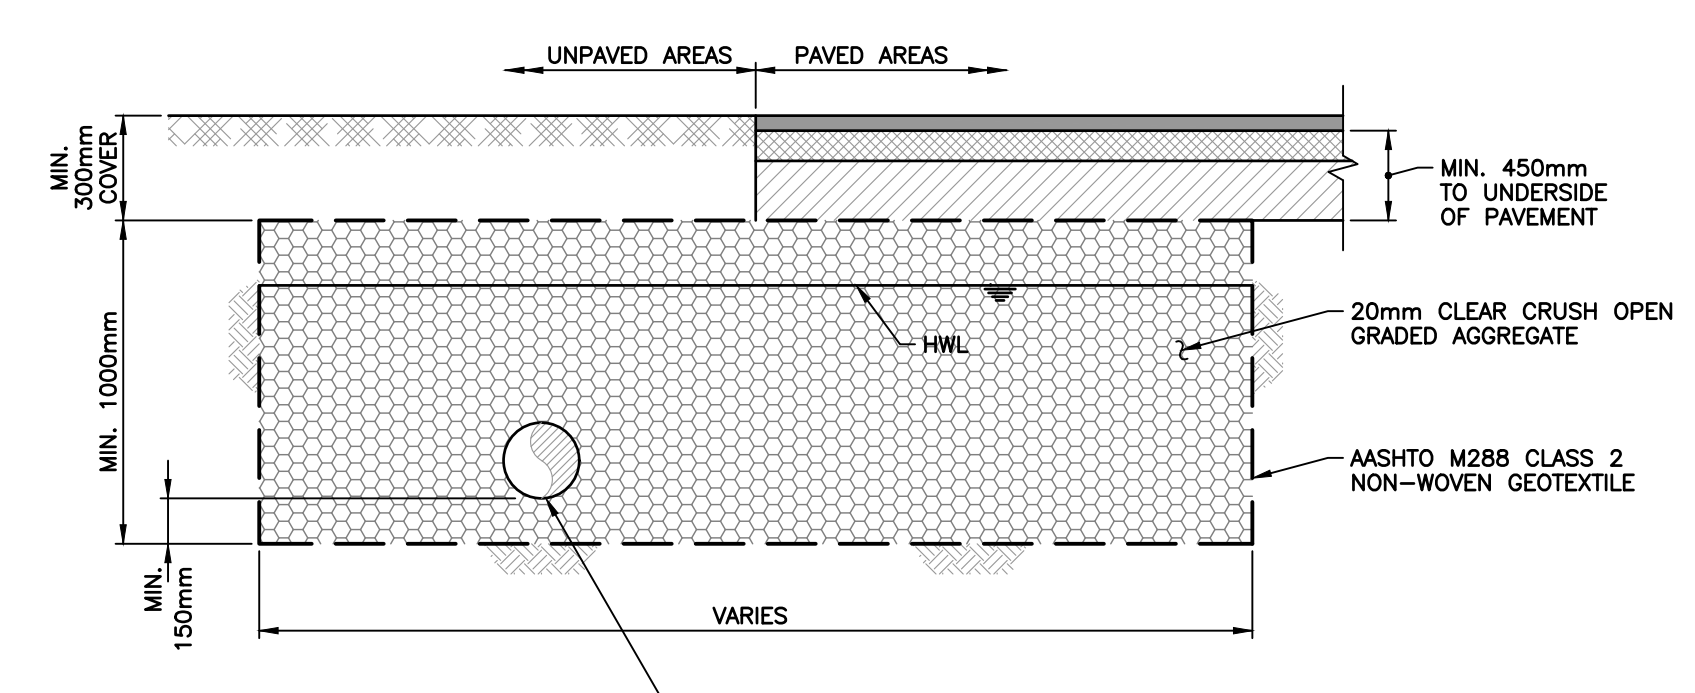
RESIDENTIAL STORMWATER ROCK PIT AND FLOW CONTROL MANHOLE
